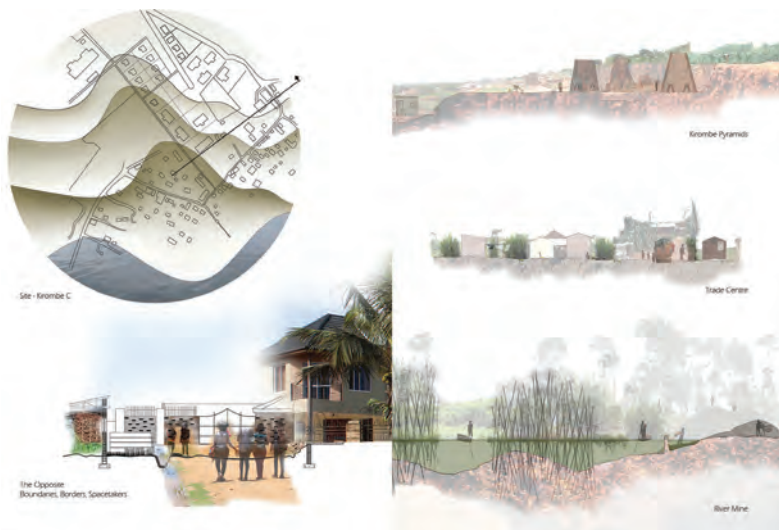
Site plan, site sections and collage on site 3 (Group E)
